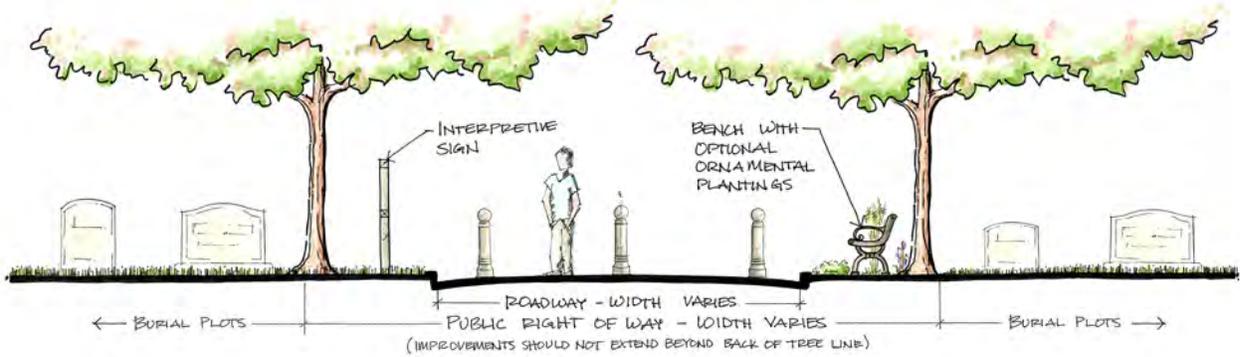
Section View of Benches and Plantings at Edges of Roadways
